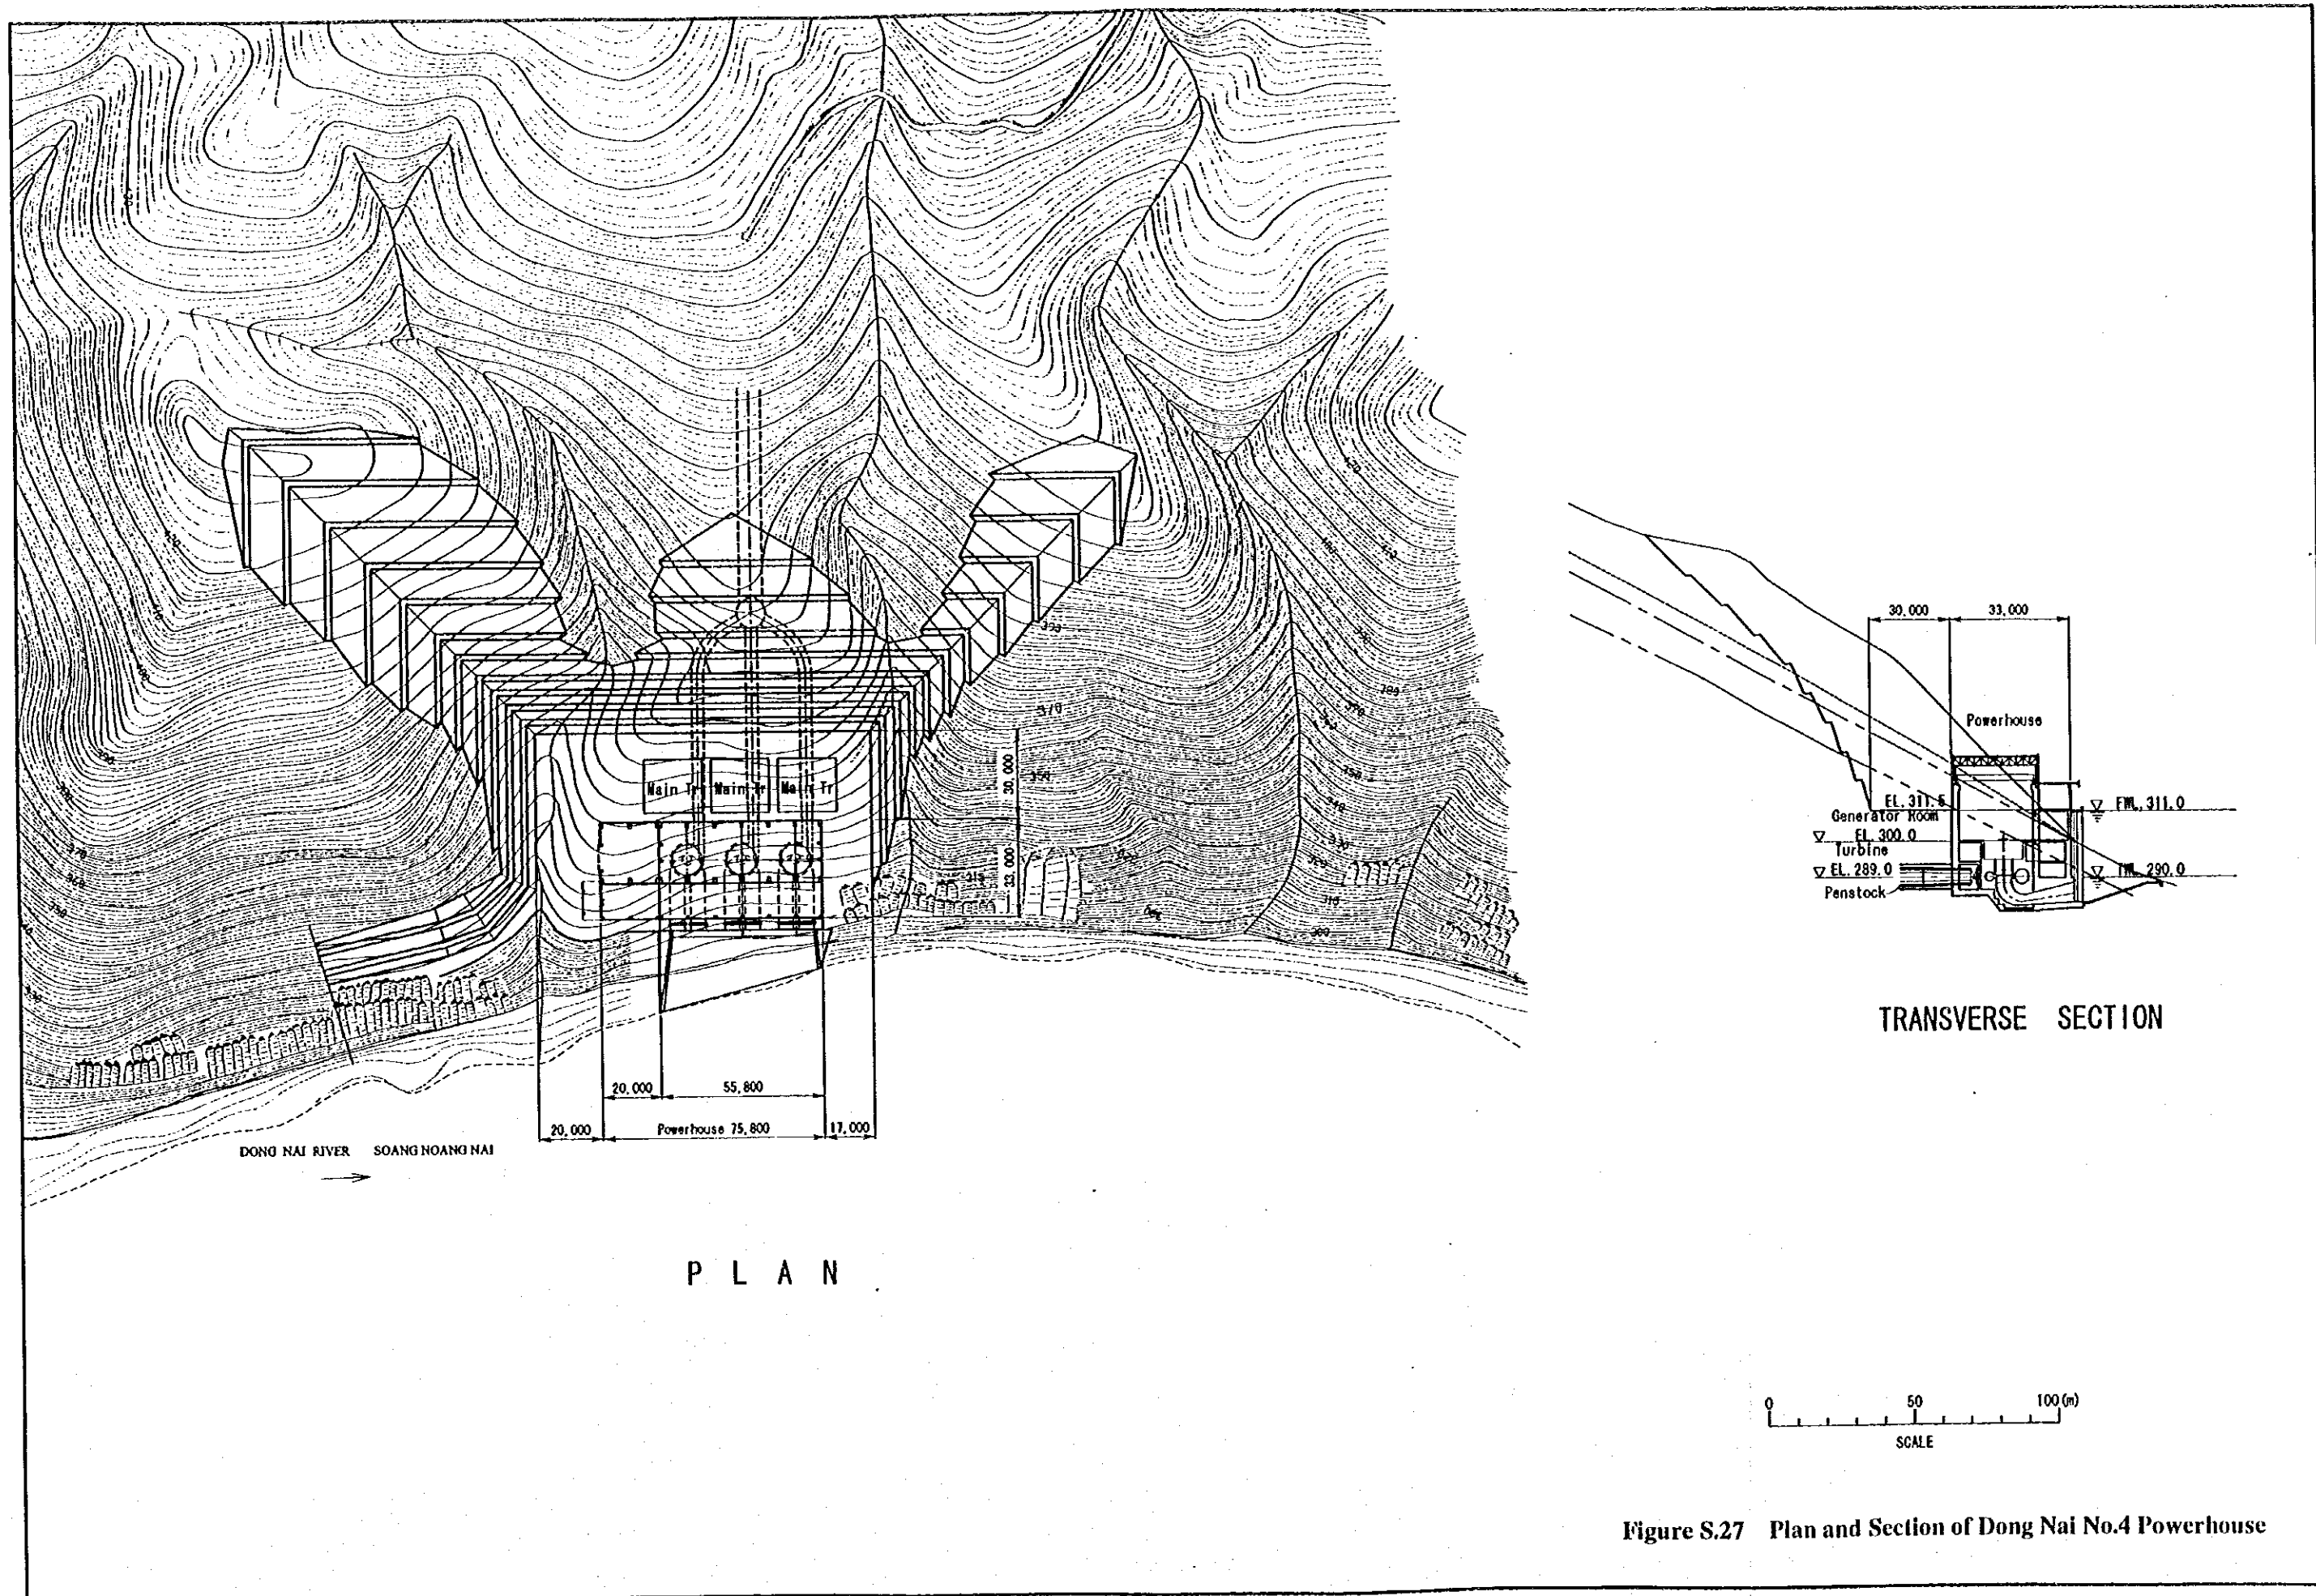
Plan and Section of Dong Nai No.4 Powerhouse
